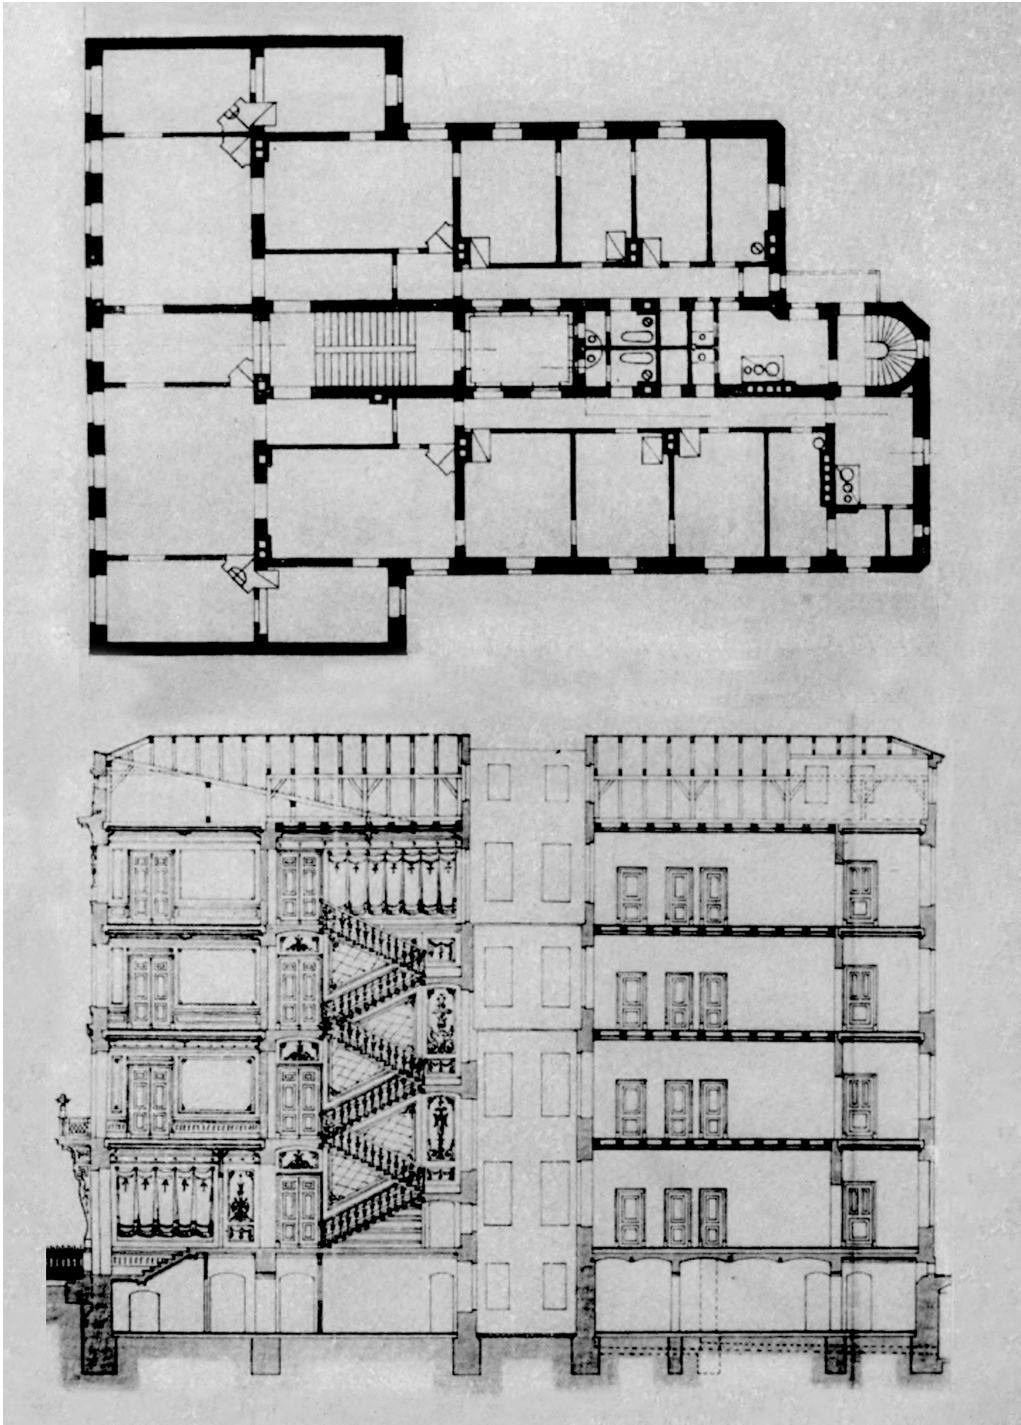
Plan and section of the rental house at Raina Boulevard 4 by J. F. Blaumanis (1880)
